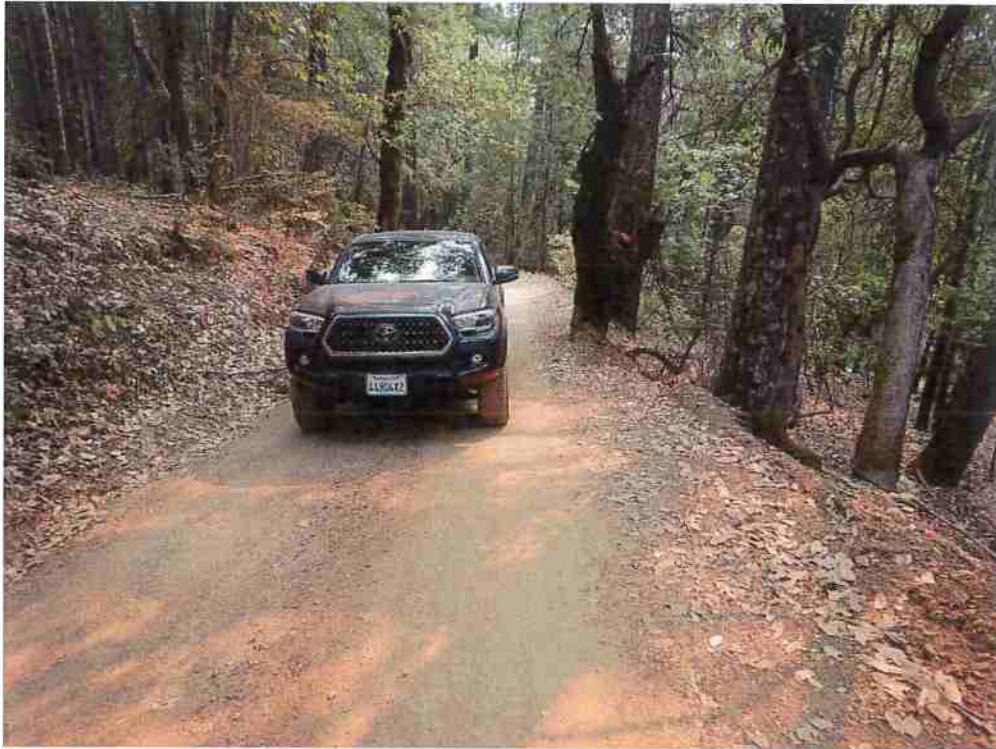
RP 3. Vehicle traveling west, photo taken facing east.
